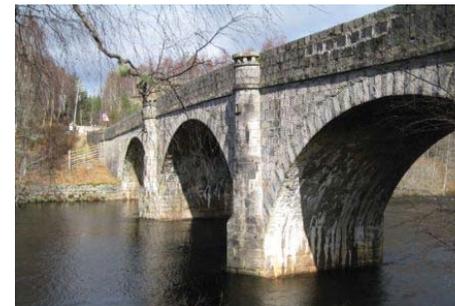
A887 Torgoyle three span stone arch bridge in NW
